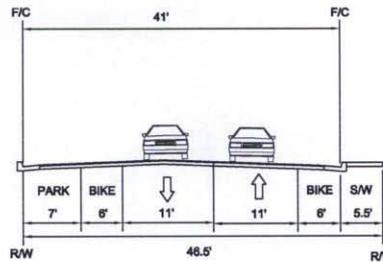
Jibboom Street Between Camille Lane and Railyards Blvd. (looking north)
